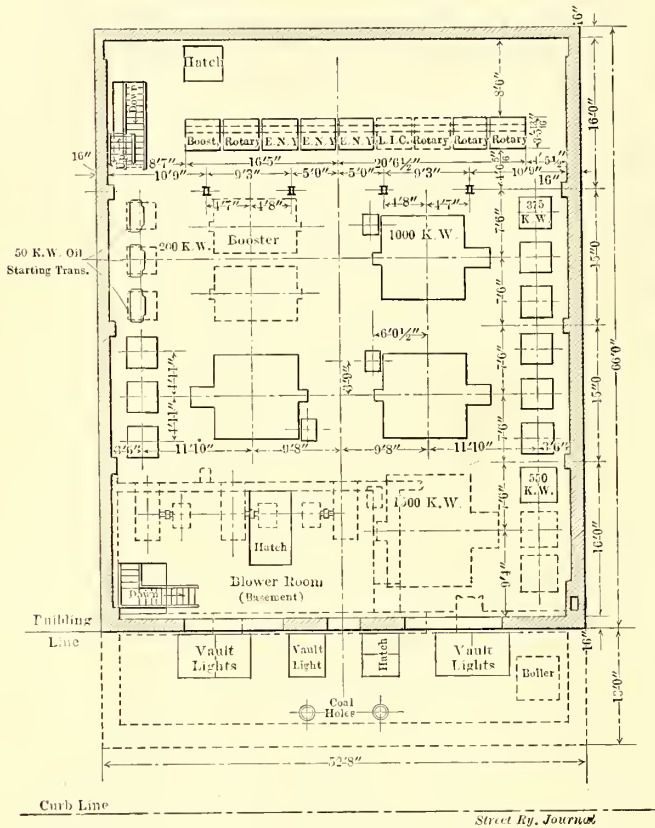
OUTLINE OF SUB-STATION AT GRAND AVENUE
